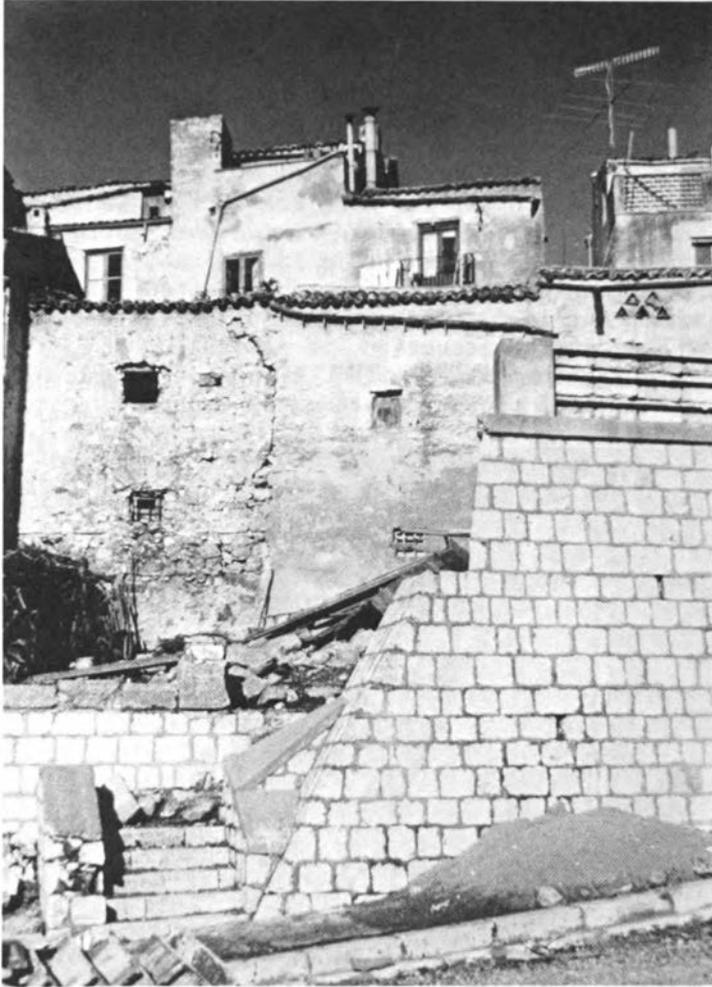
Vita. Church facade, showing fallen roof, wall and masonry ornamentation.
